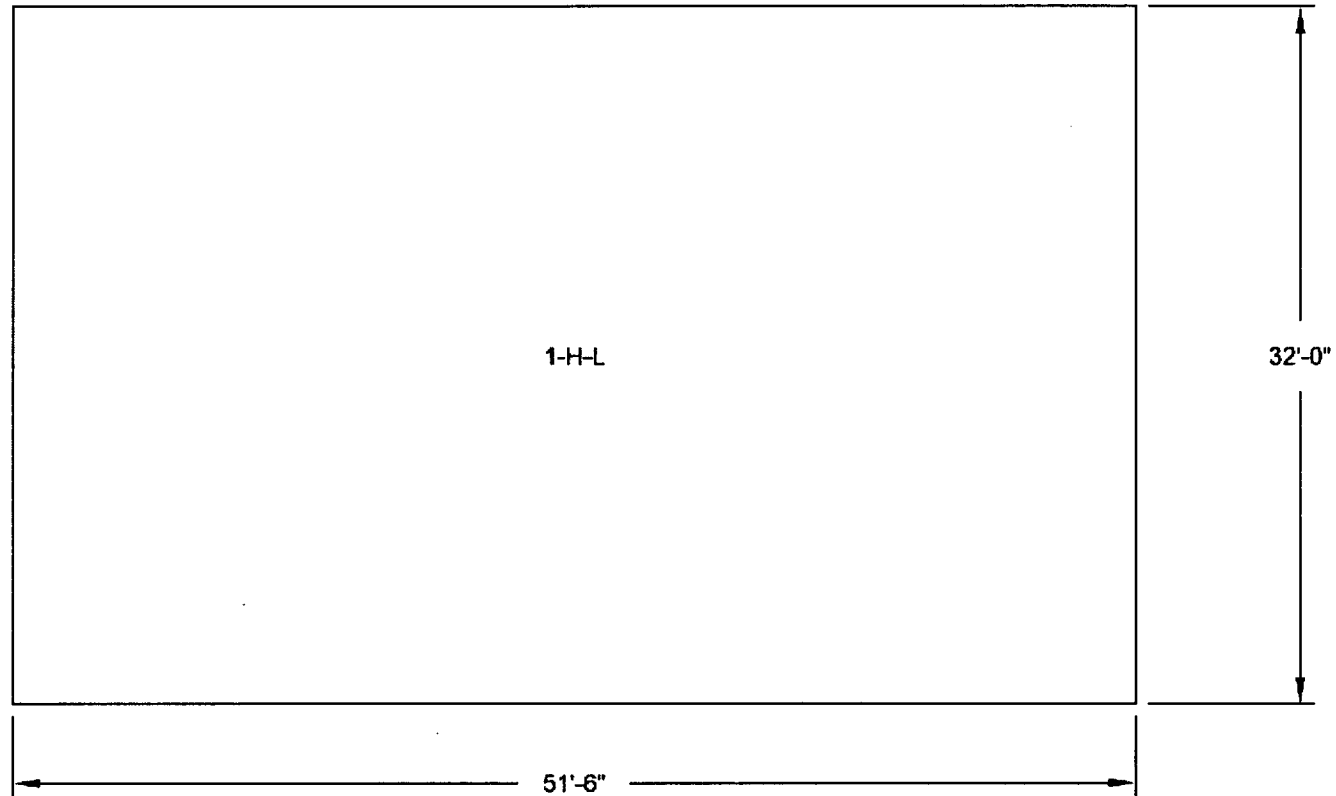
H.6-146 ~~Slab 1 Looking Down Transverse Reinforcement Zones Not Used~~
